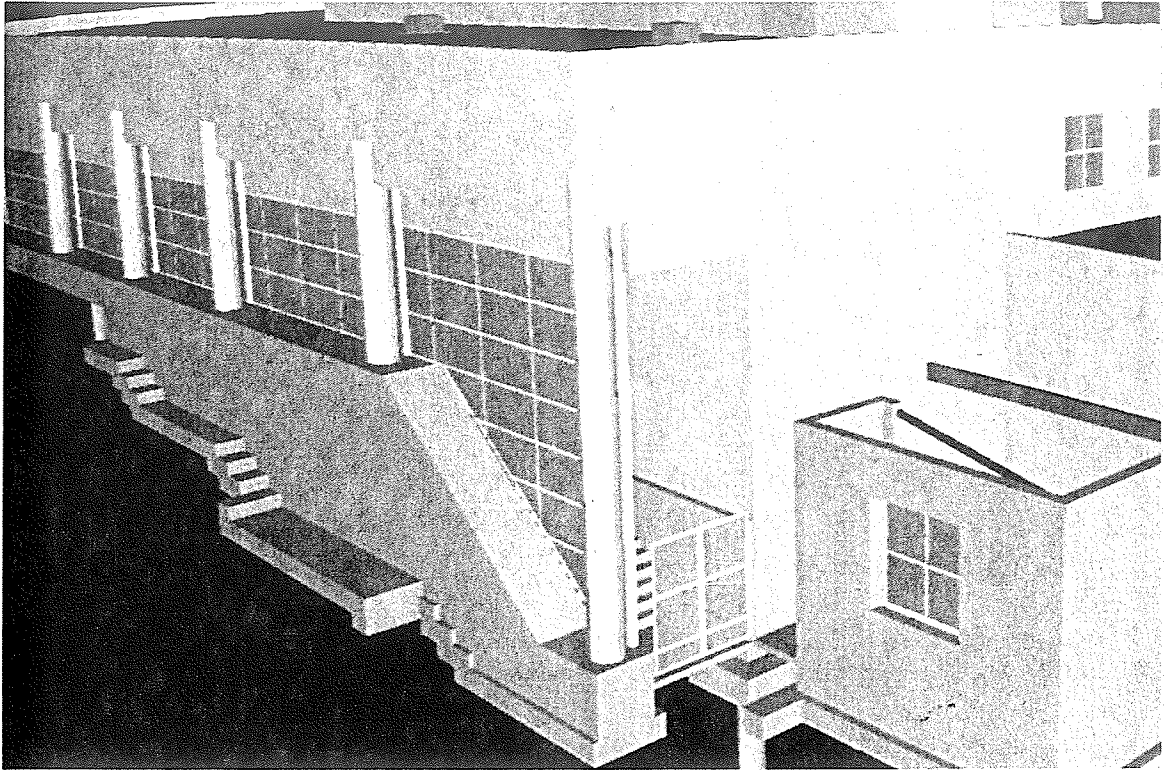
3D model of retaining wall, interpreted from architect's 2D drawings.
